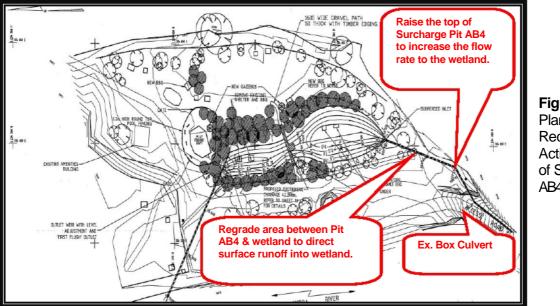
Plan Showing Recommended Actions in vicinity of Surcharge Pit AB4
